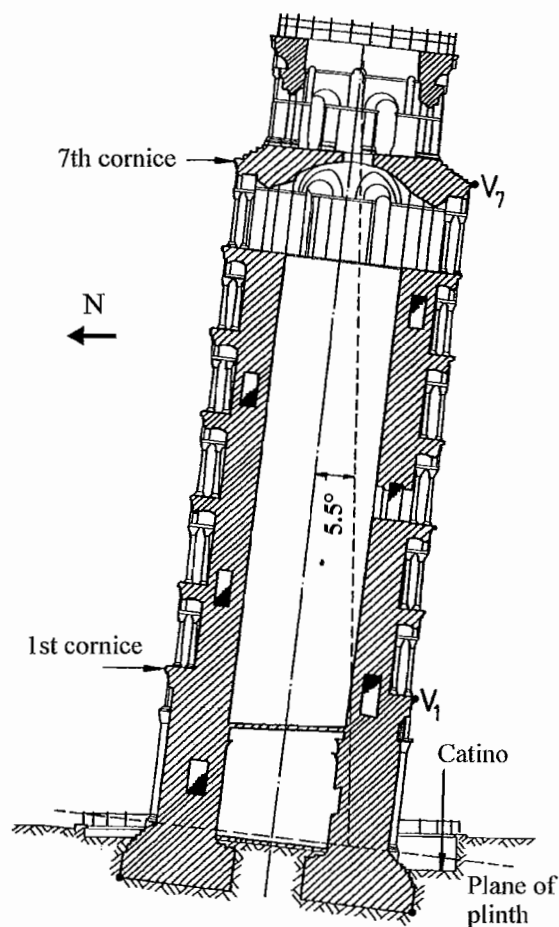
Cross section of the leaning Tower of Pisa in the plane of maximum inclination (i.e., very nearly, in the plane north - south).
